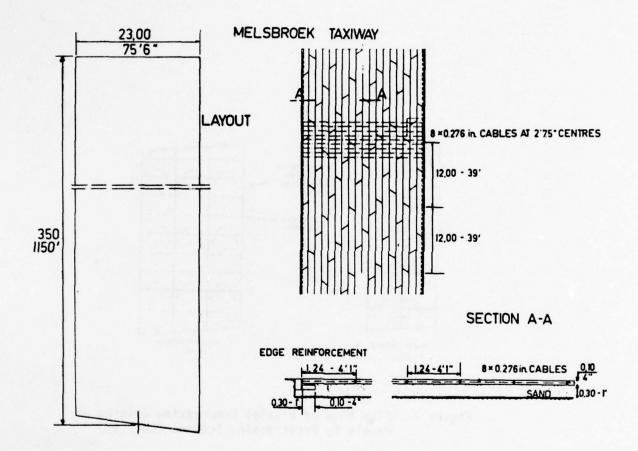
Layout for precast slab assembly - Melsbroek Airport (Ref. 75).
